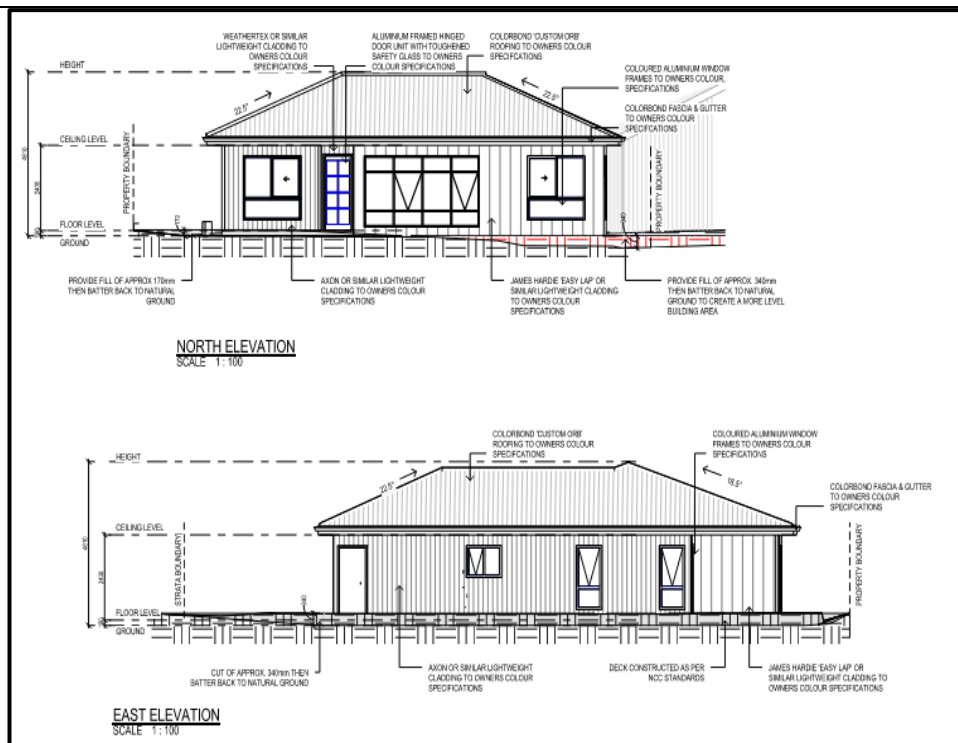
Excerpt of plans submitted showing the north and east elevation.
